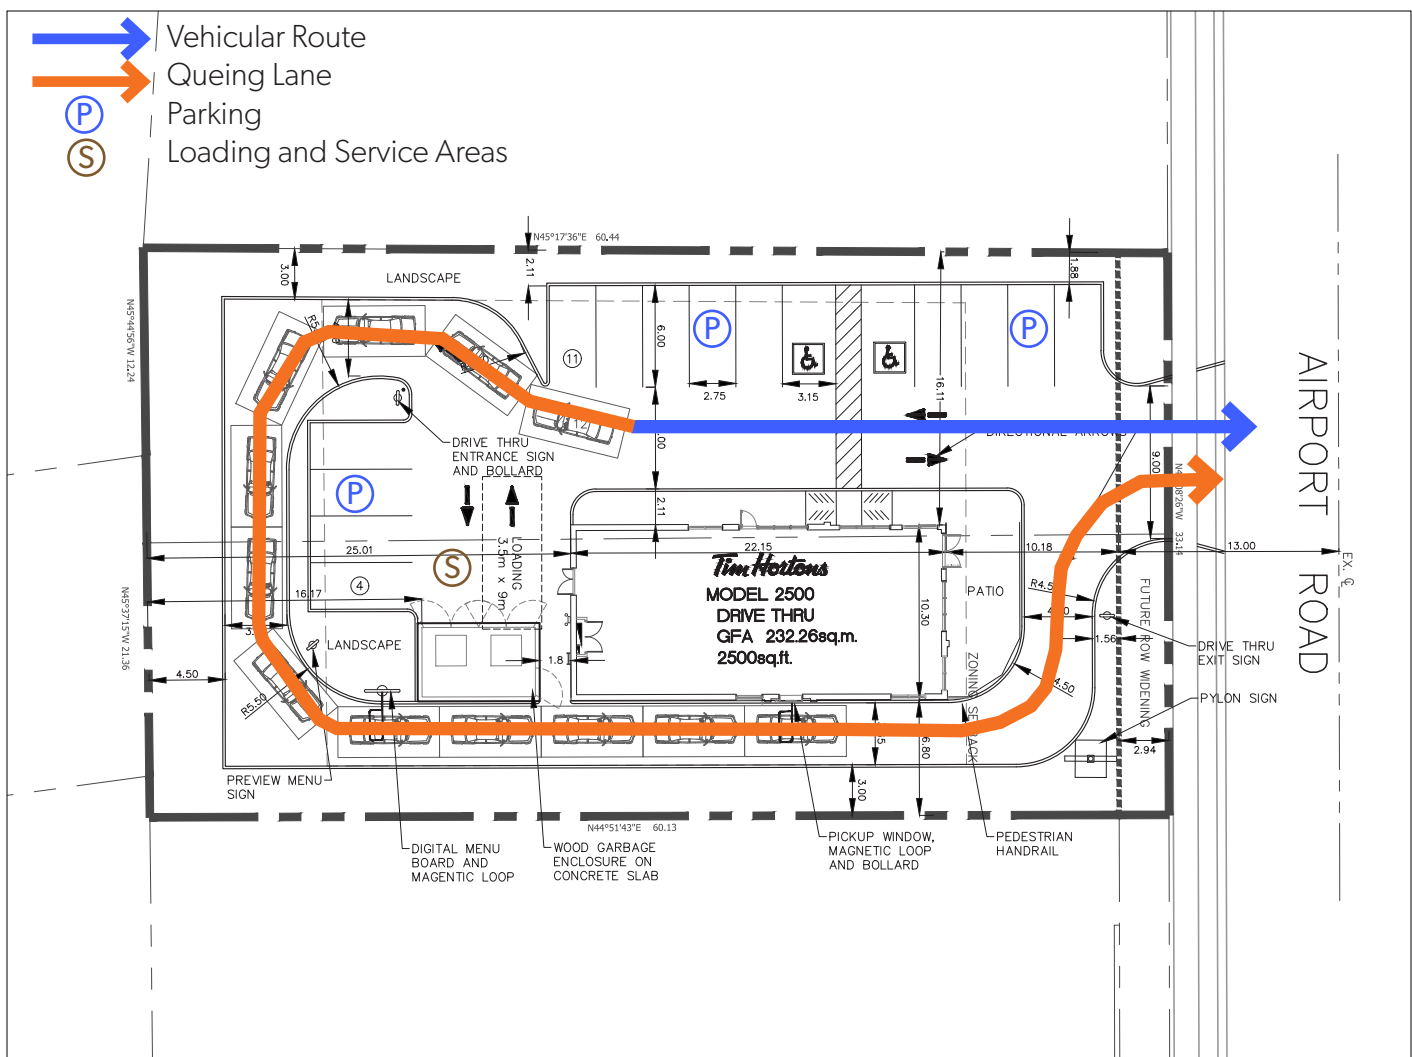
Proposed Site Plan illustrating vehicular access and circulation, and queuing lane
